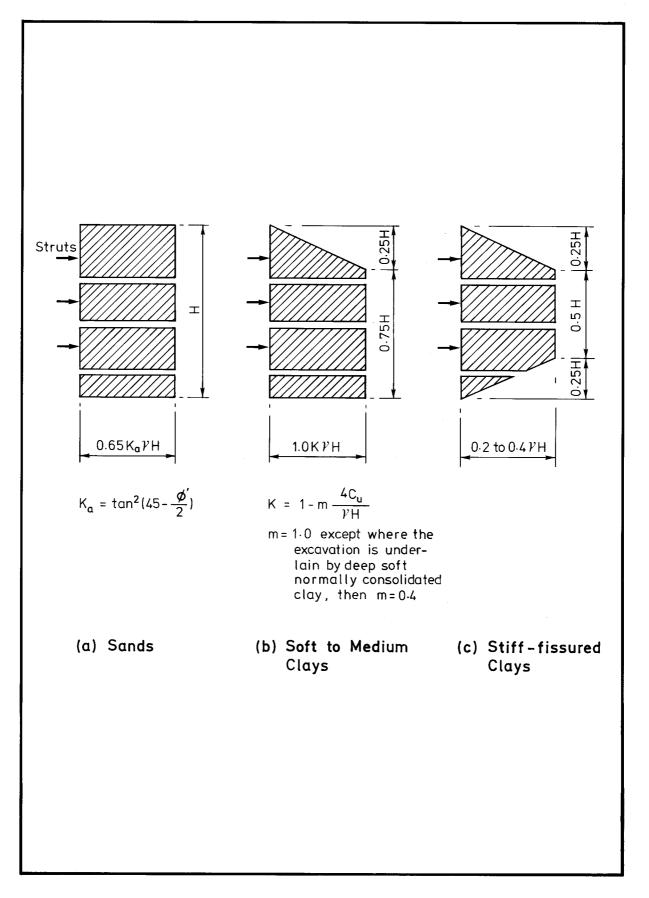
Apparent Pressure Diagrams for Computing Strut Loads in Strutted Excavations (Peck, 1969b)
